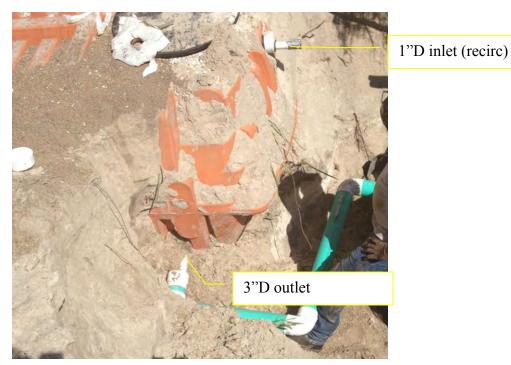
Stage 1 biofilter 3"D outlet pipe, with cleanout
